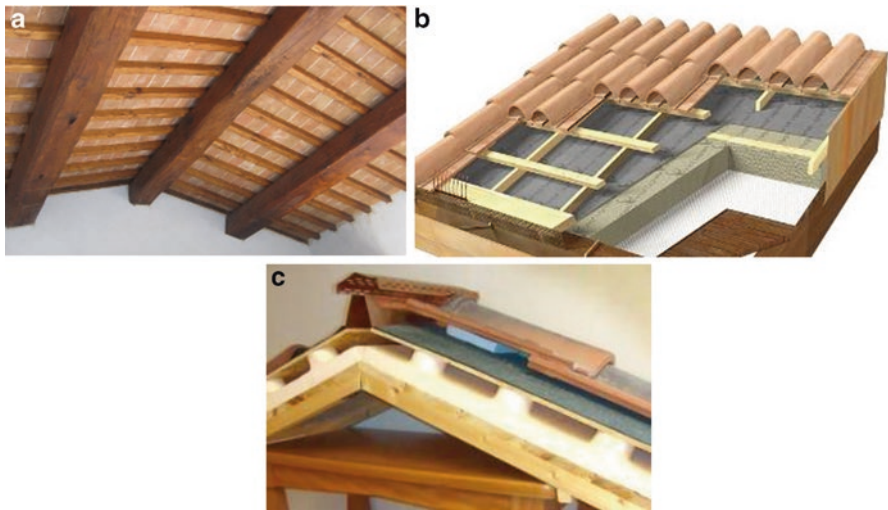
(a–c) The traditional wood ventilated roof: internal view, the different layers and the new insulated version
